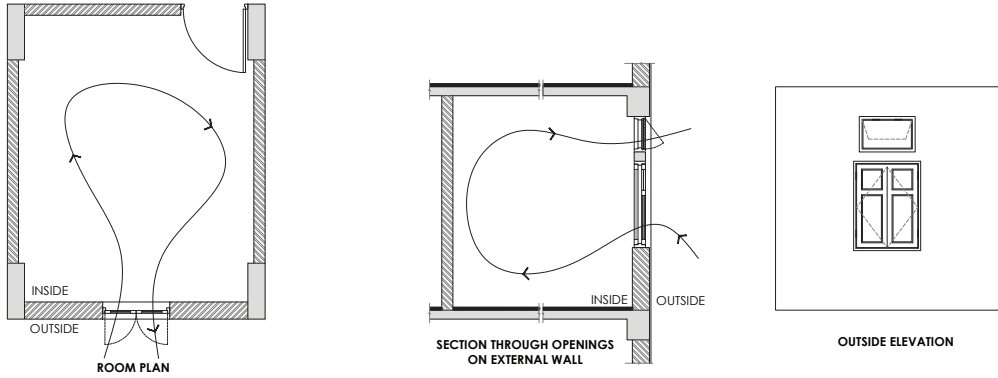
Adding ventilators above windows improves ventilation especially when only single external wall is available for openings (Guideline)
